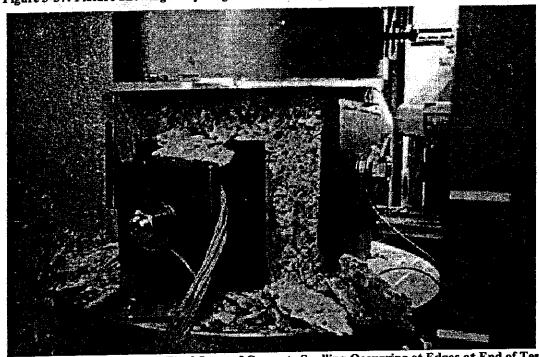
Picture Showing Final Stage of Concrete Spalling Occurring at Edges at End of Test
